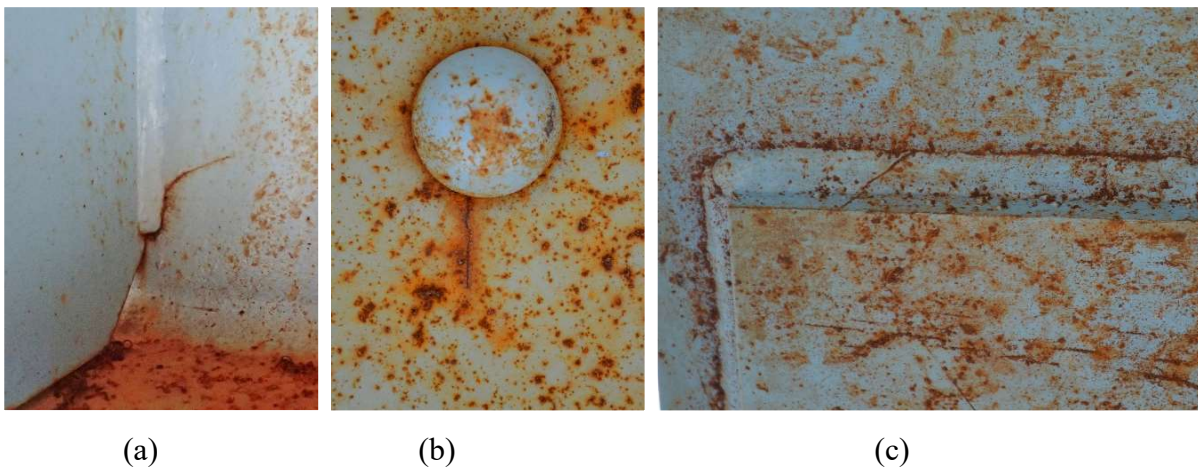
Photograph of a typical (a) out-of-plane crack, (b) rivet hole crack, and (c) weld toe crack
